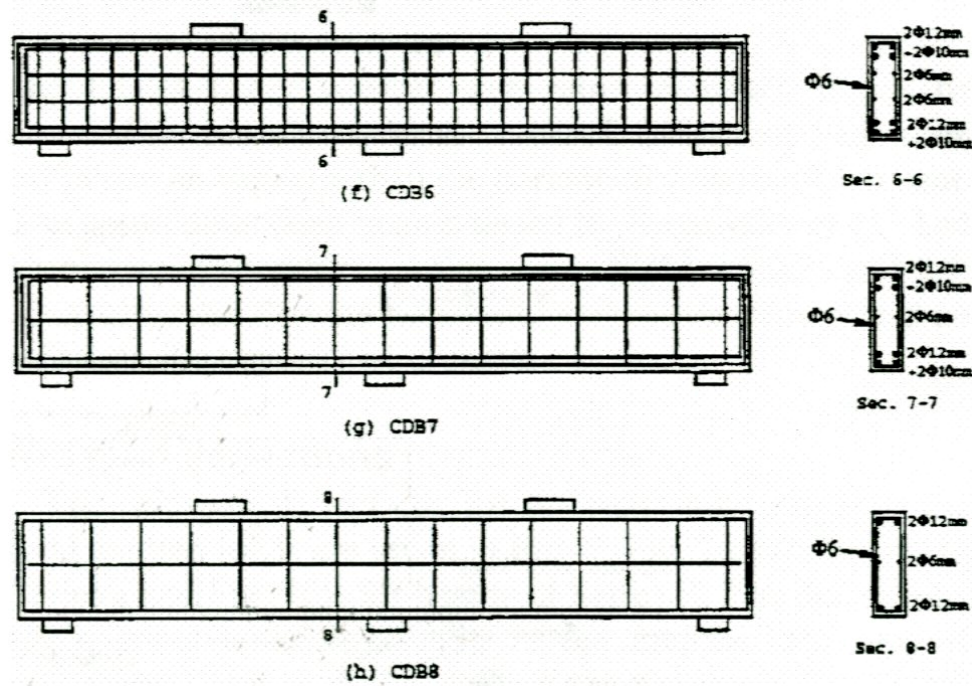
Details of specimen reinforcement (Ashour 1997)
